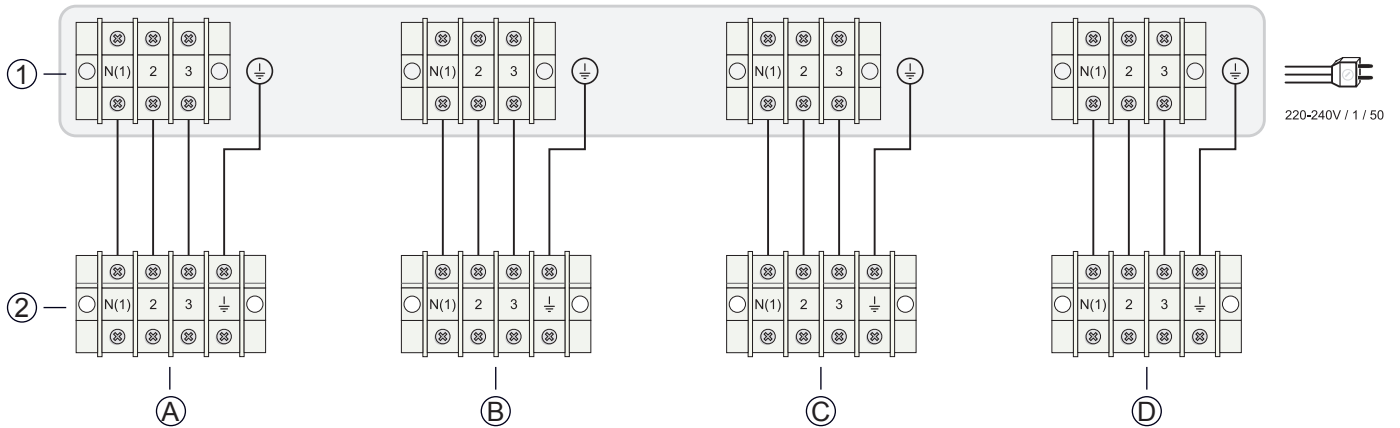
Electrical layout for outdoor and indoor connection.
